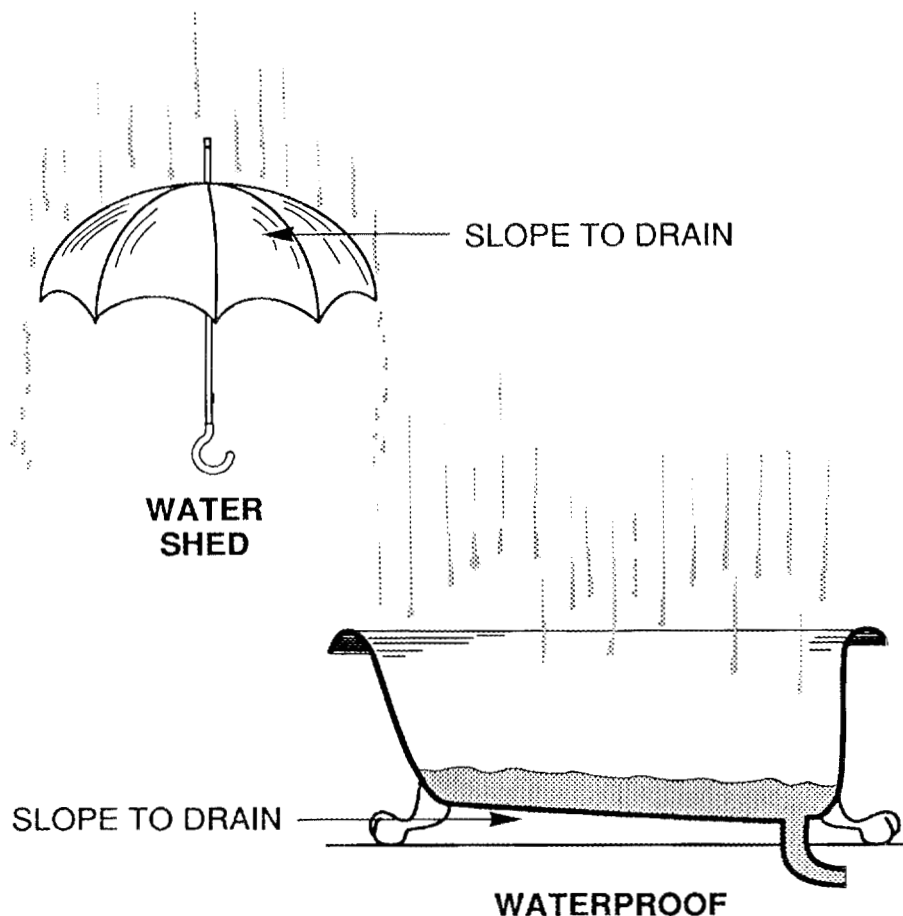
Waterproof roofs, like the bathtub, rely on a *continuous impenetrable membrane to hold water* until gravity can drain it away. Some waterproof roofs in the past have been designed to hold water continuously (like the tub with the stopper in place), but this is not current practice. Watershed roofs, like the umbrella, rely on the *pull of gravity to remove water* before it can penetrate to the area below. These represent the two distinctly differing approaches to roofing.
